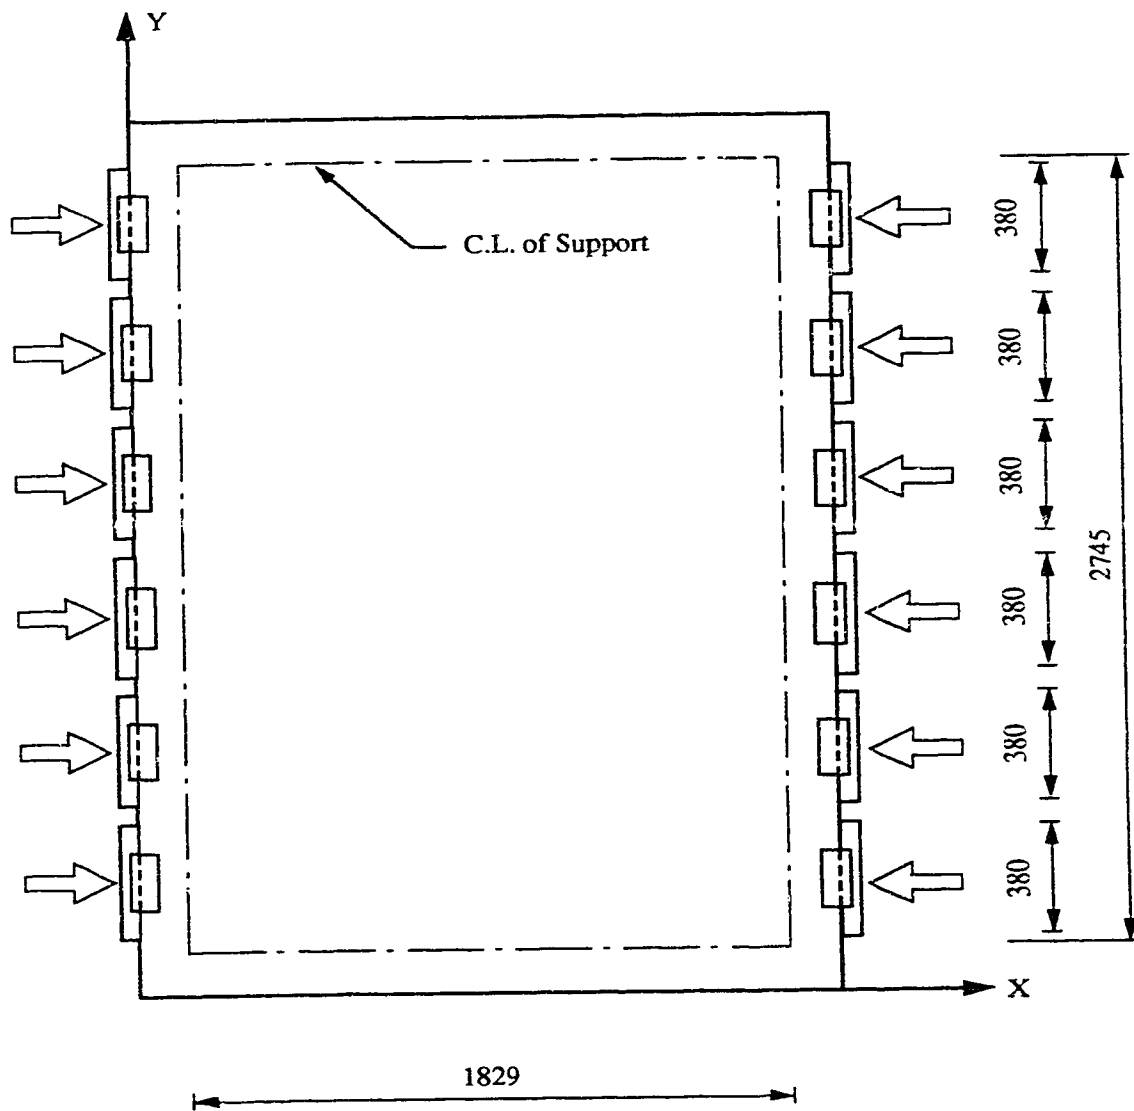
Arrangement of the Inplane Loading Plates for Specimen B4
